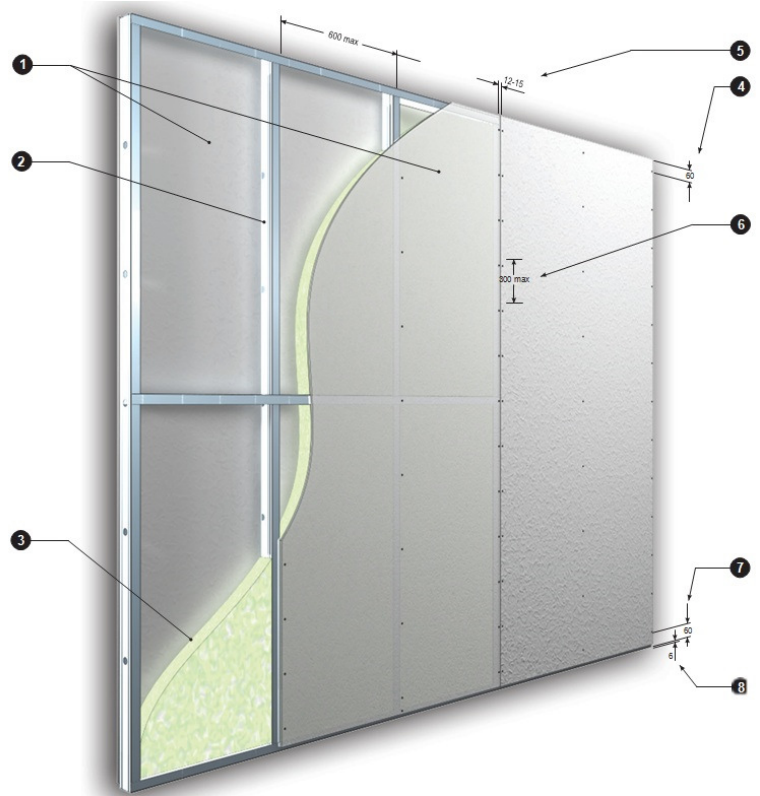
Steel Fire Wall Installation Detail (Vertical)
